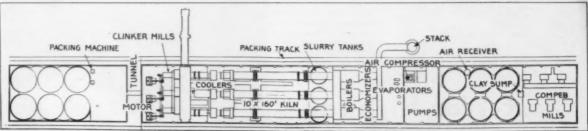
Plan of Manitowoc Portland Cement Co. plant at Manitowoc, Wis.
